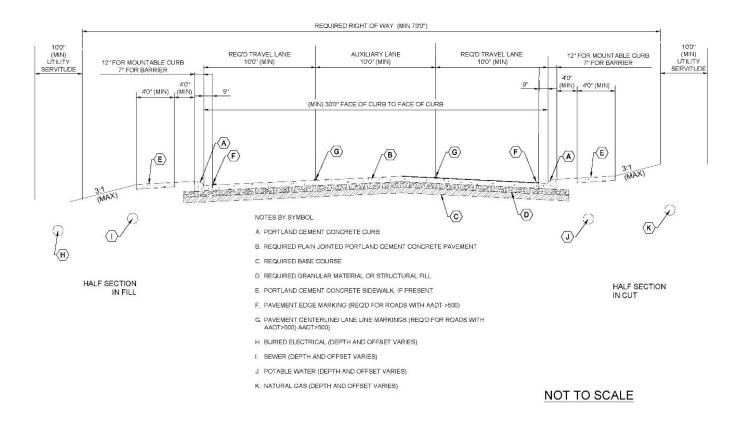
Cross Section Elements and Requirements for Curbed Roadway, 3-Lane Portland Cement Concrete Pavement.
